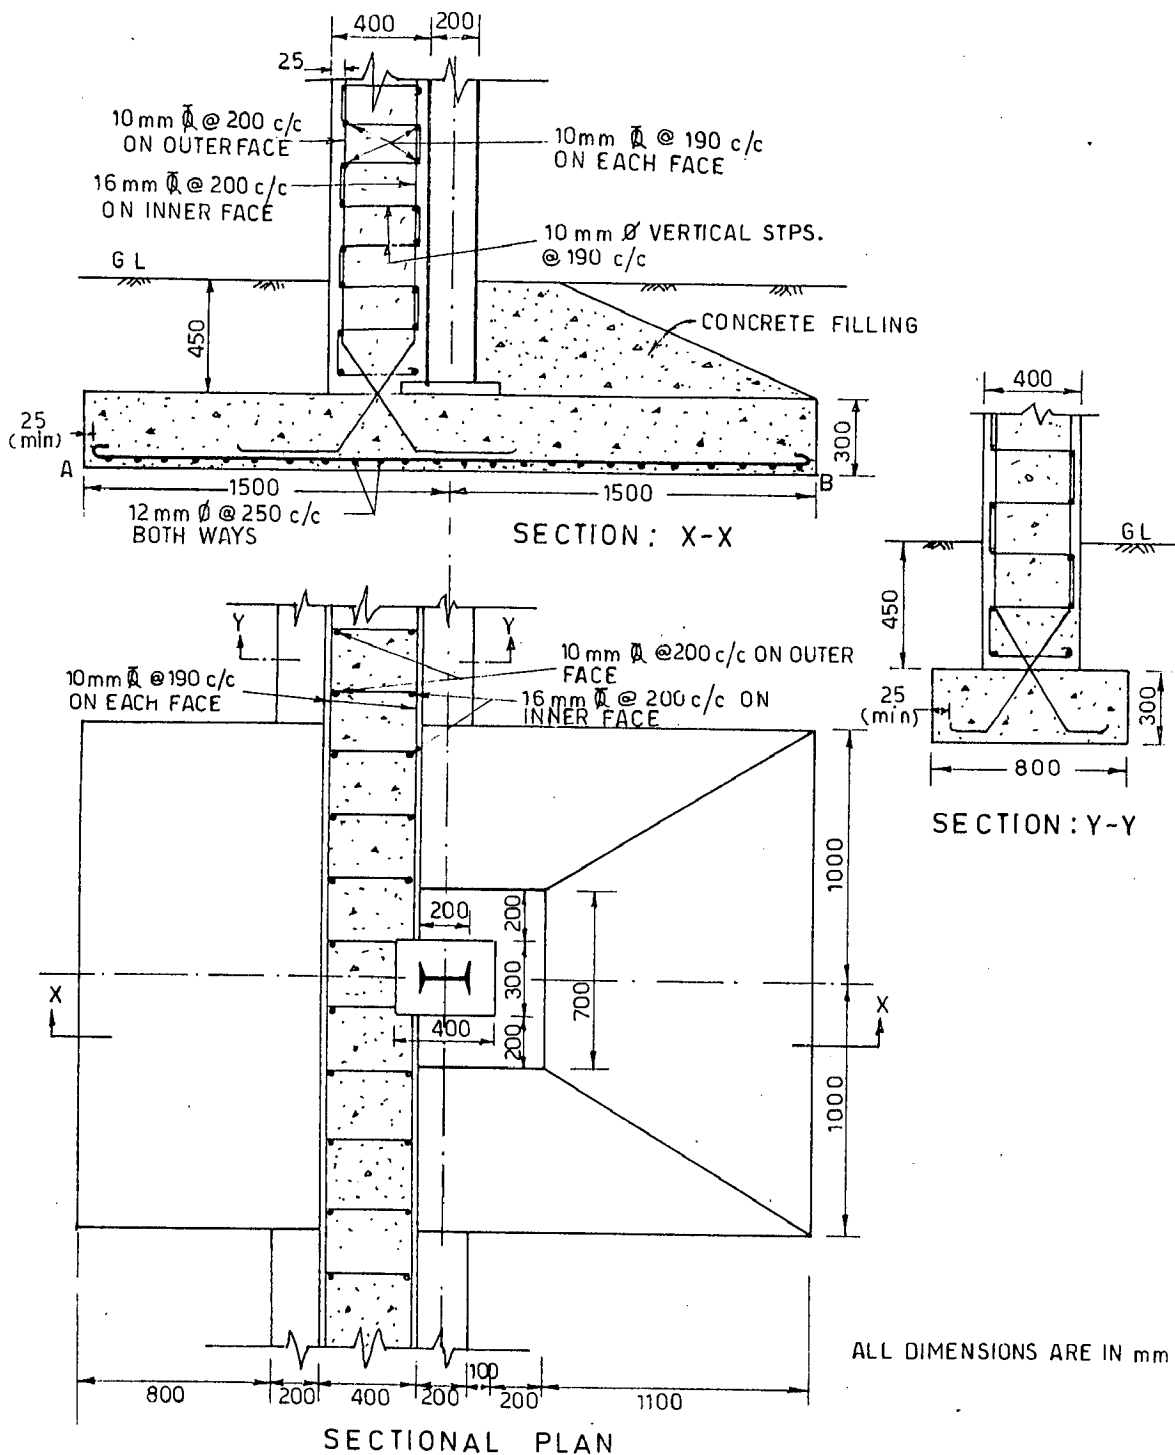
DETAILS OF R.C.C. WALL, COLUMN FOOTING AND FOUNDATION OF R.C.C. WALL
